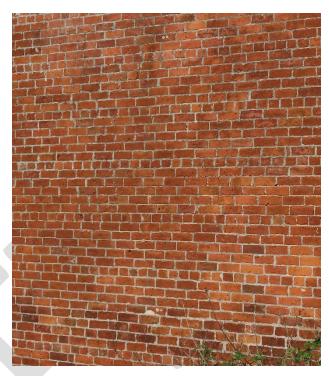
Example of a brick wall laid in common bond with sixth row headers
